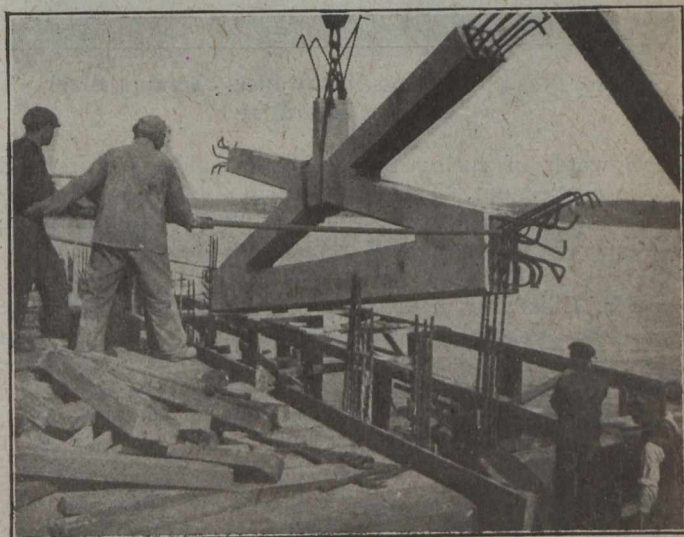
Furness Withy Pier—Reinforced Concrete Brace Member
